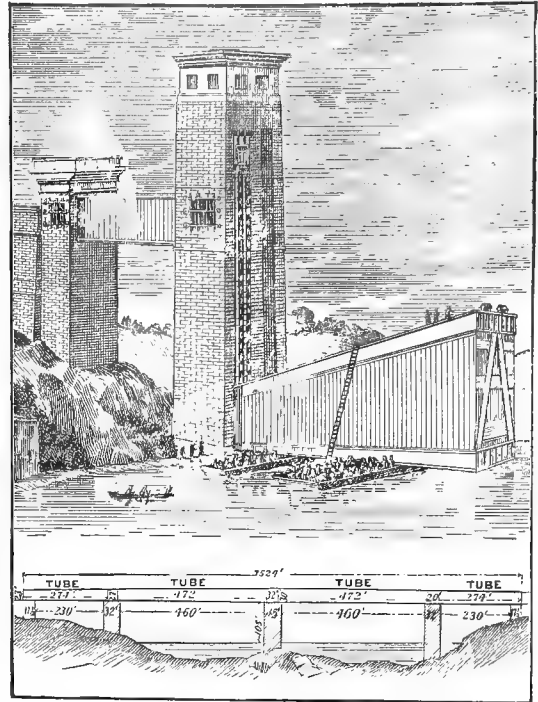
Erection of Britannia Tubular Bridge, Wales.
